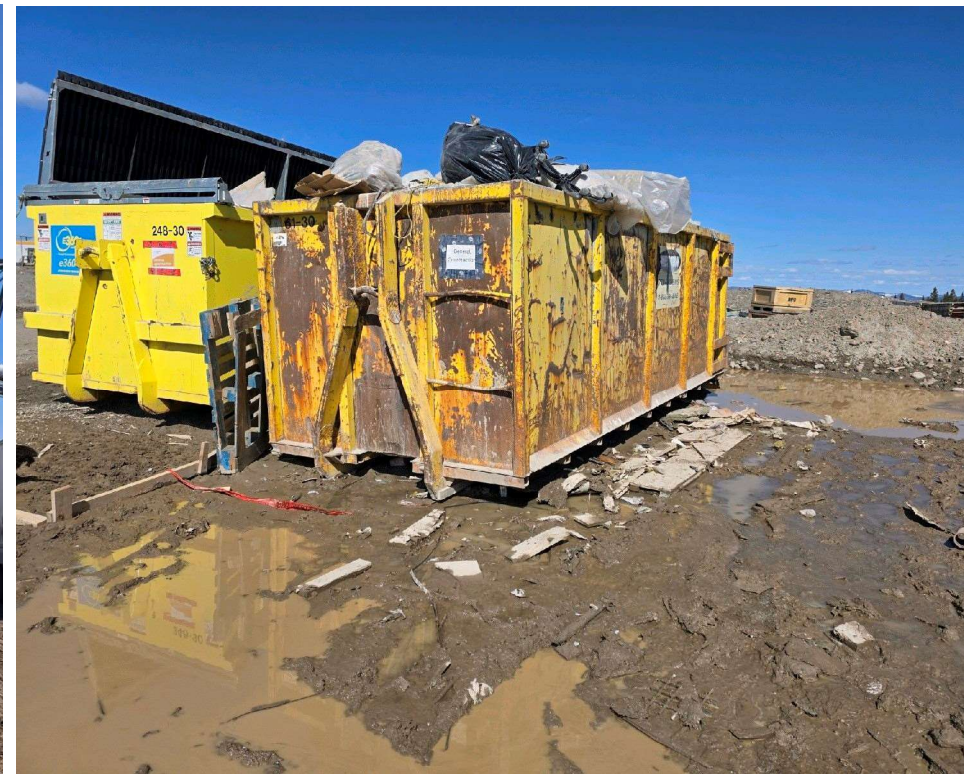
Construction waste bins (no food/domestic waste present) overtopped at the Plant site. Issued as an opportunity for improvement.
